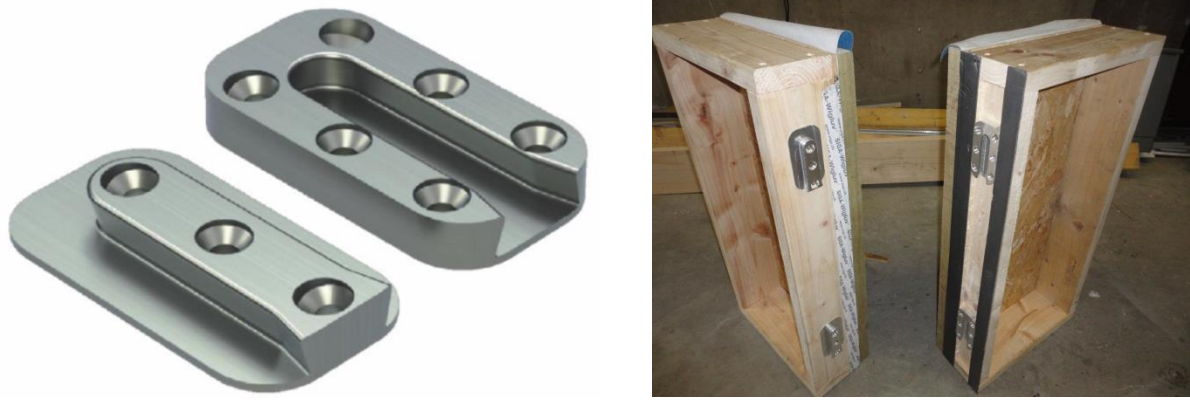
Sherpa™ Type B Connector and its application in a scale model wall test
